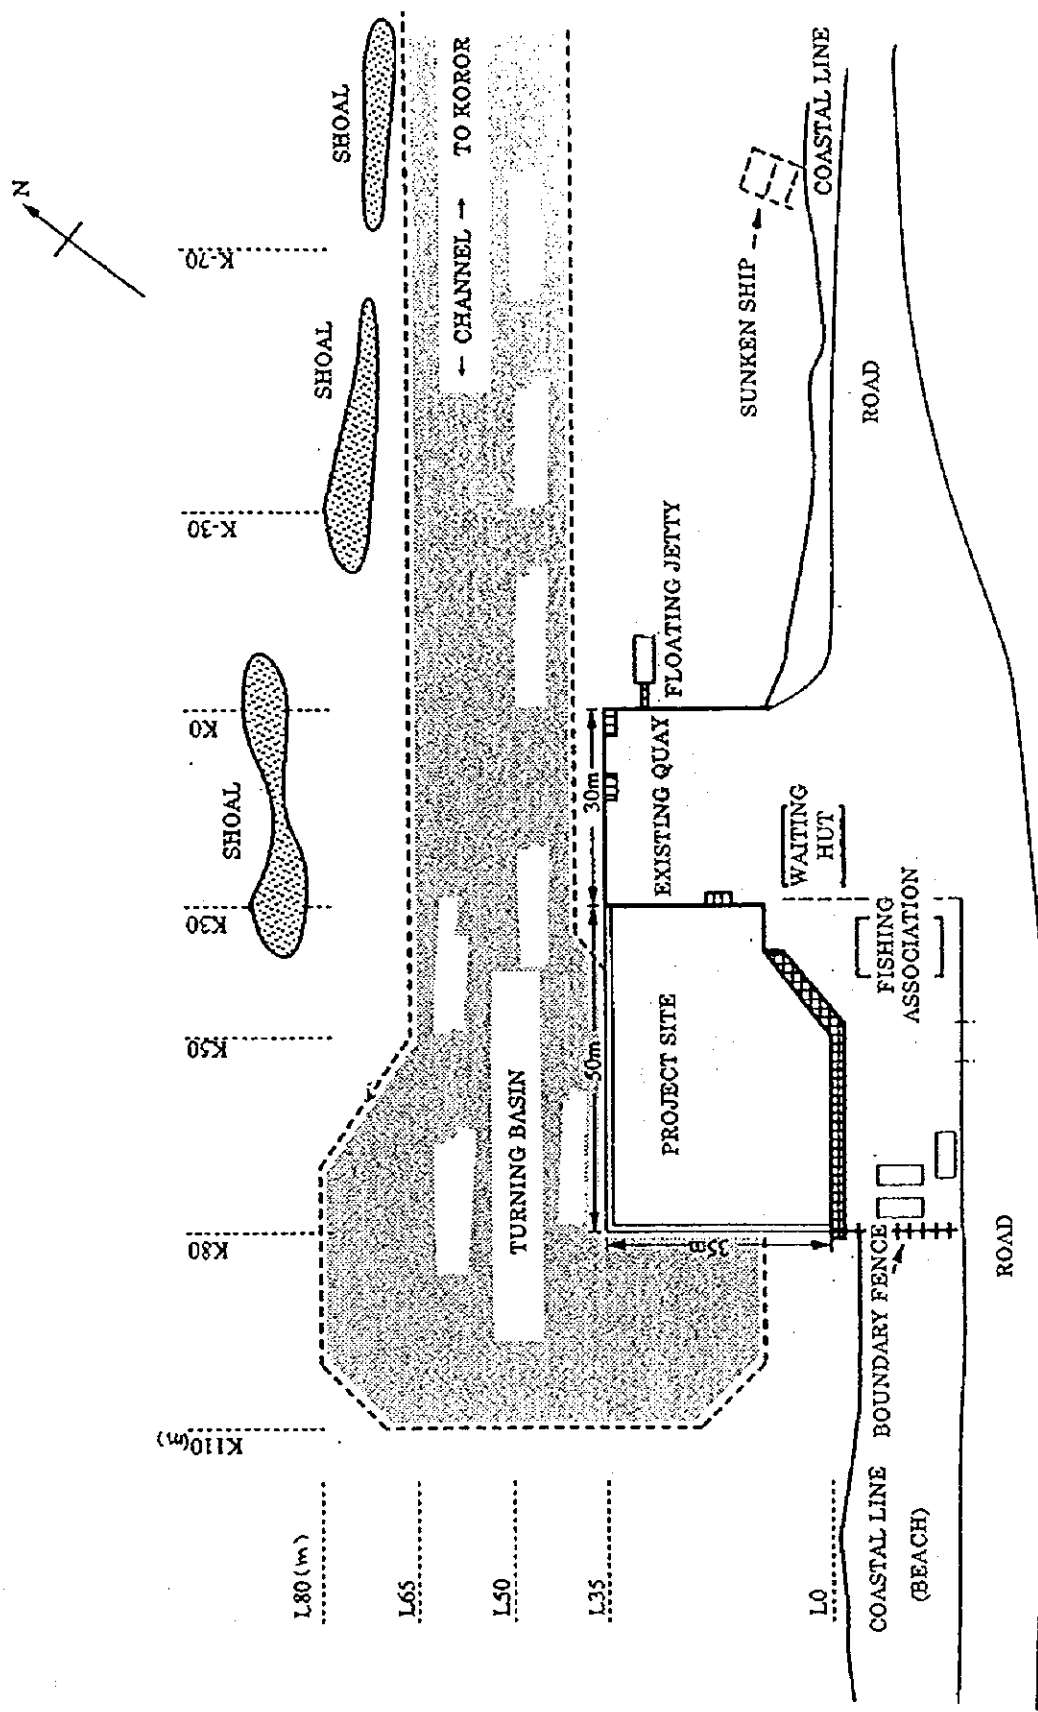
General Layout Plan of Requested Port Facilities
